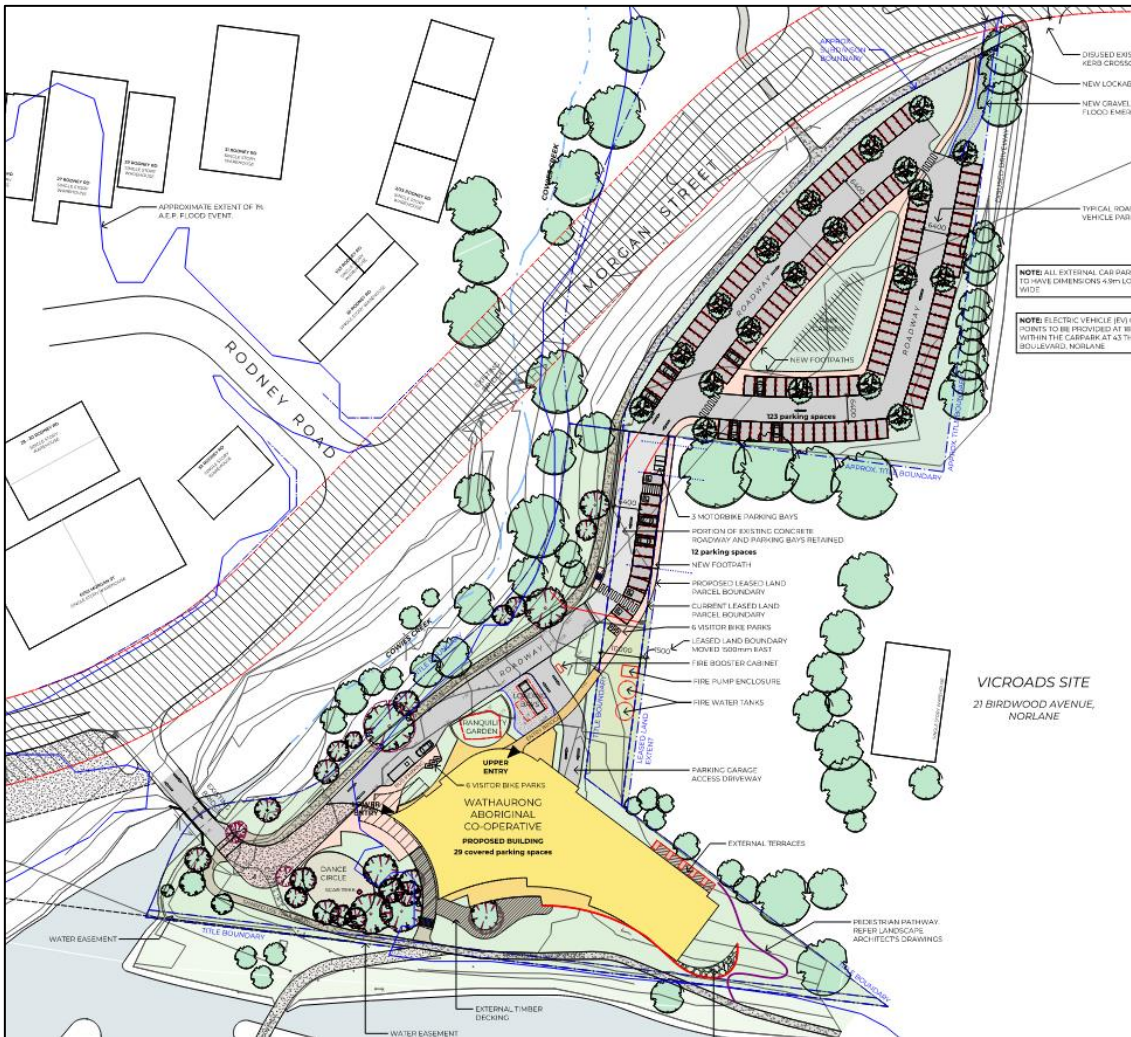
Architectural layout plan (A-TP-1101 Rev D)
